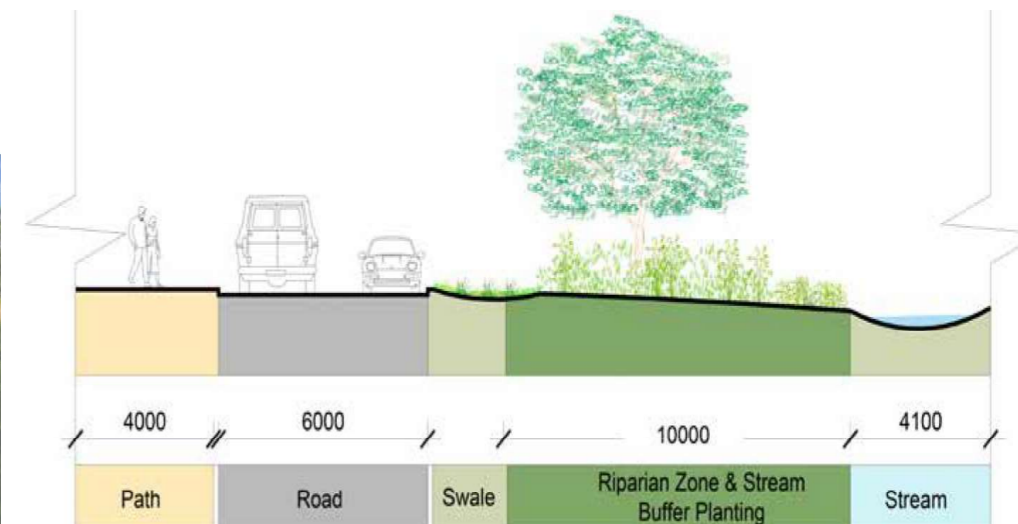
Landscape site plan & section showing Ballydonnell Upper Stream
